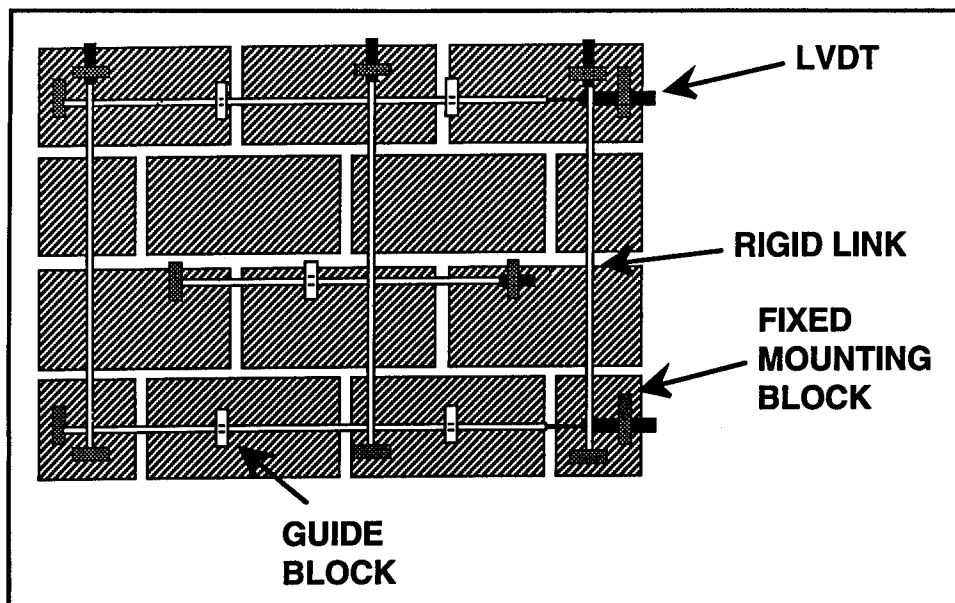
Typical instrumentation plan for masonry panel (identical each side)
